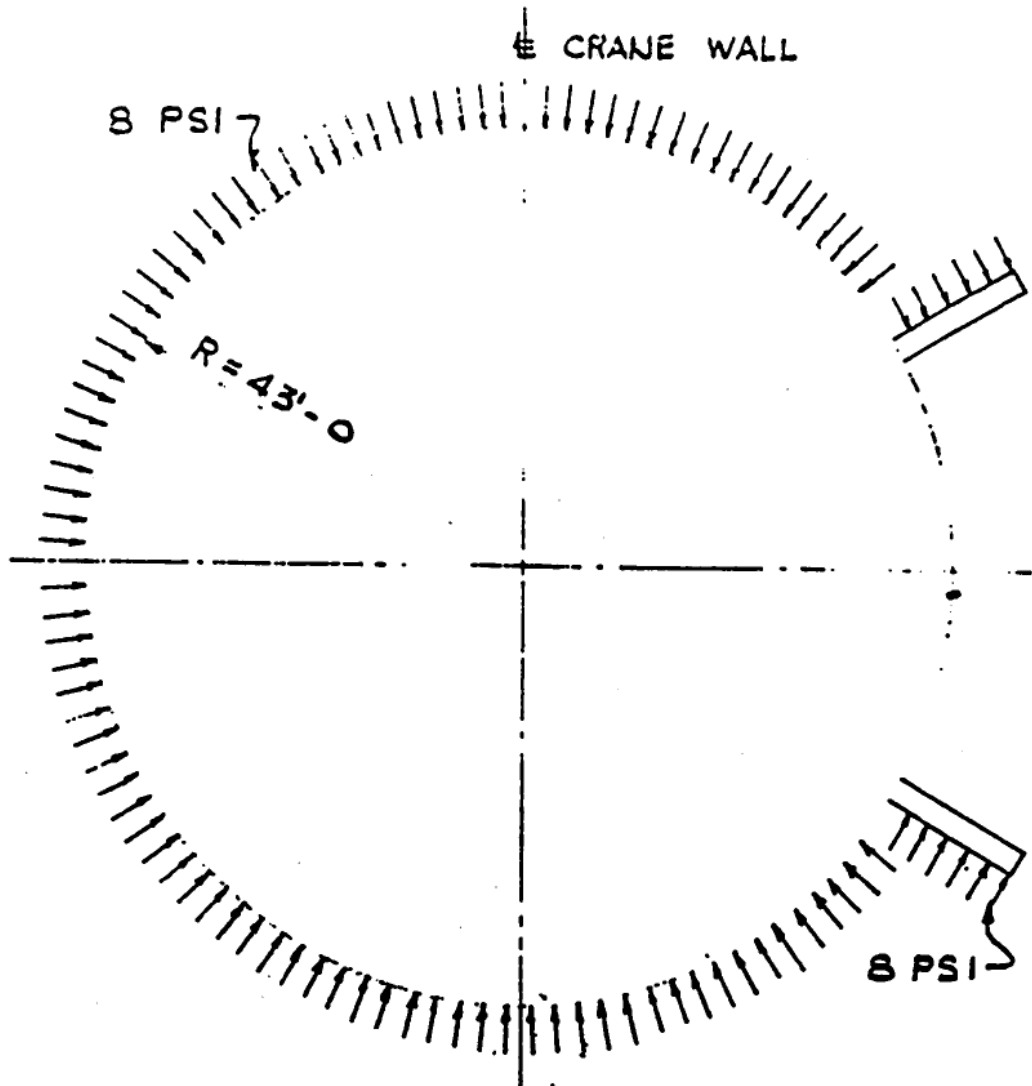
26. 2-1 LOADING DIAGAM OF UPPER CRANE WALL
